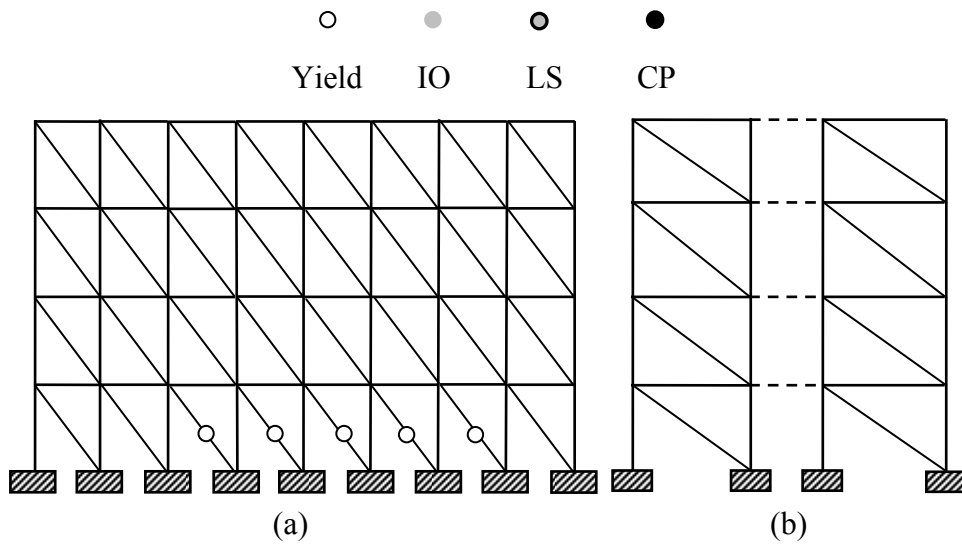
Hinge pattern under gravity load for the four storey uniformly infilled SMRF building, when construction sequence is not considered in analysis: (a) typical longitudinal frame; (b) typical transverse frame.
